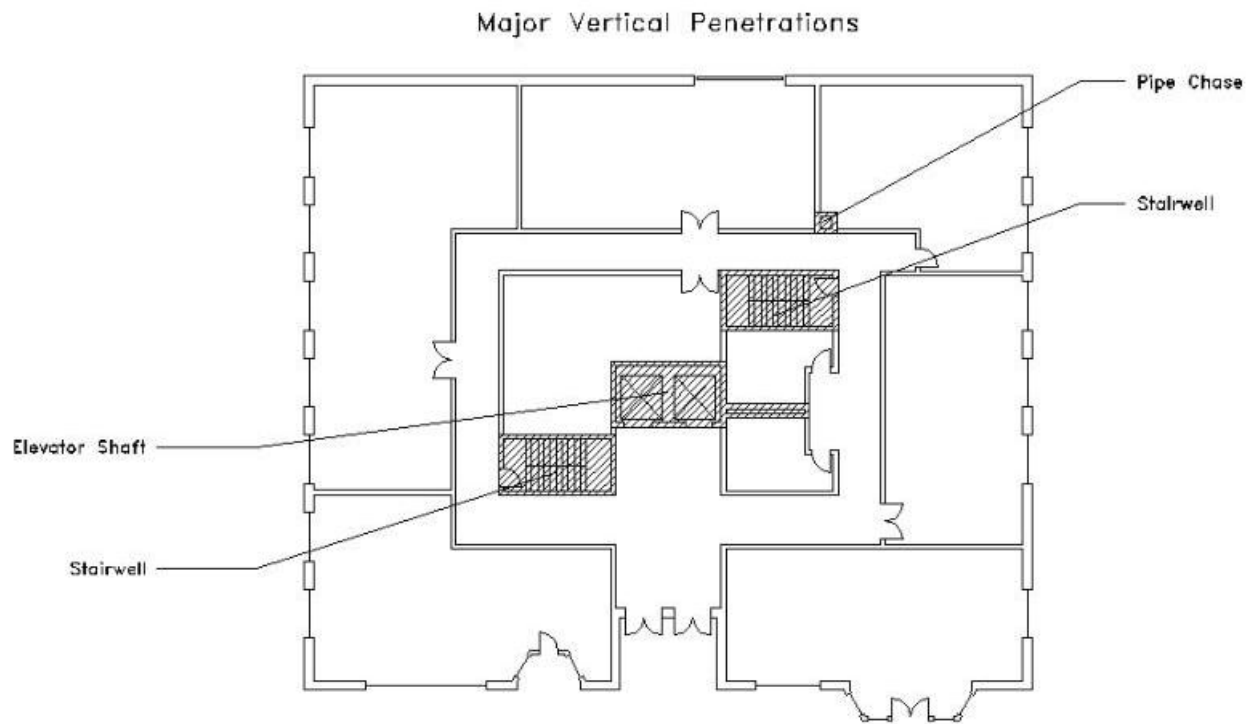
Floor plan labeled “Major Vertical Penetrations” showing a building layout with shaded areas indicating stairwells, an elevator shaft, and a pipe chase. The diagram outlines enclosing walls and vertical shafts penetrating multiple floors, distinguishing these elements from surrounding rooms and corridors.
